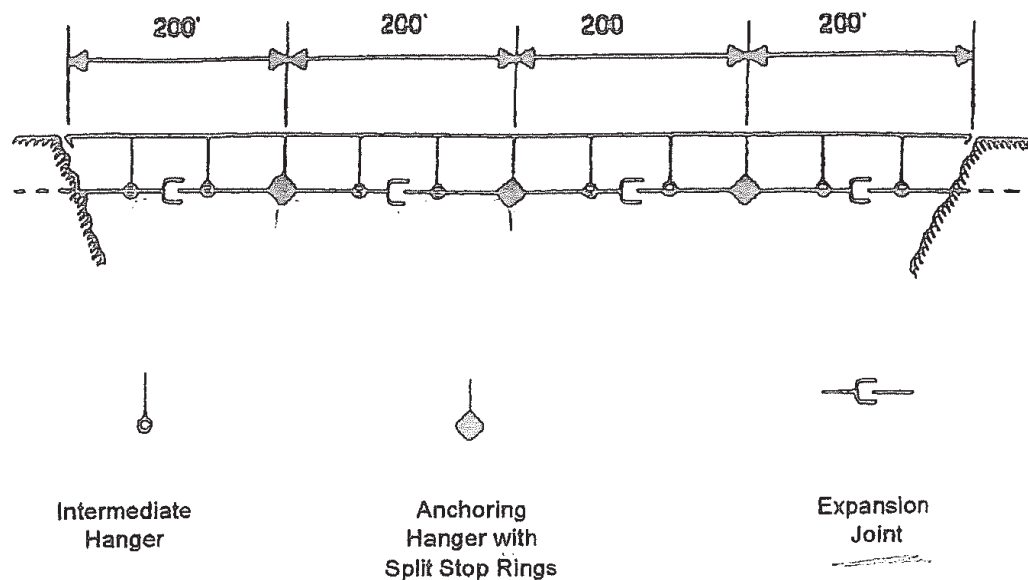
Sample plan showing arrangement of expansion and fixed joints
